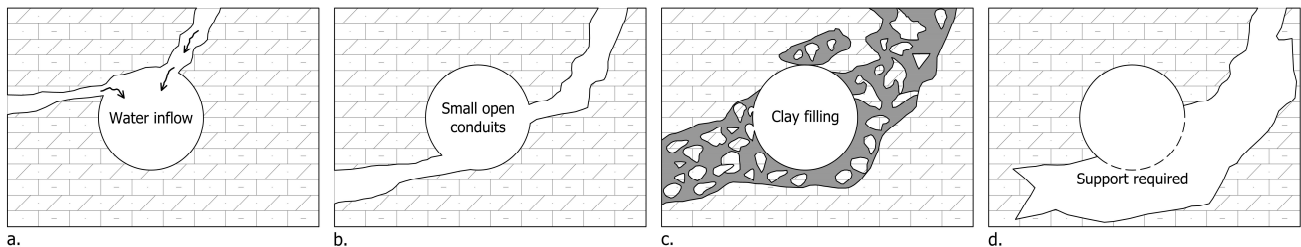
Different types of karst formations a) cracks and pockets filled with water b) smaller open dry conduits c) karst cracks and pockets filled with clay material d) large karst caverns that require filling with adequate material [3]
